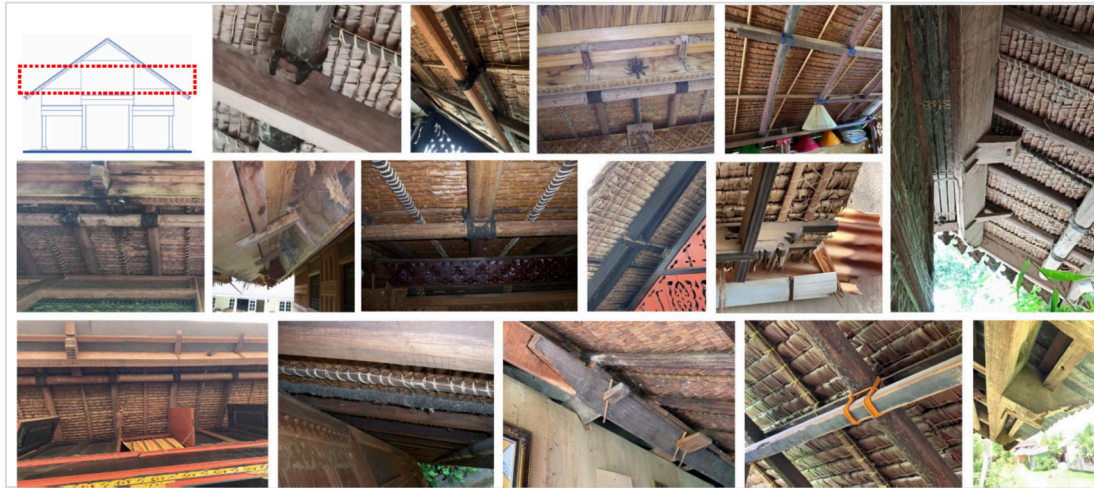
Documentation of connection on roof frame construction in *Rumoh Aceh
